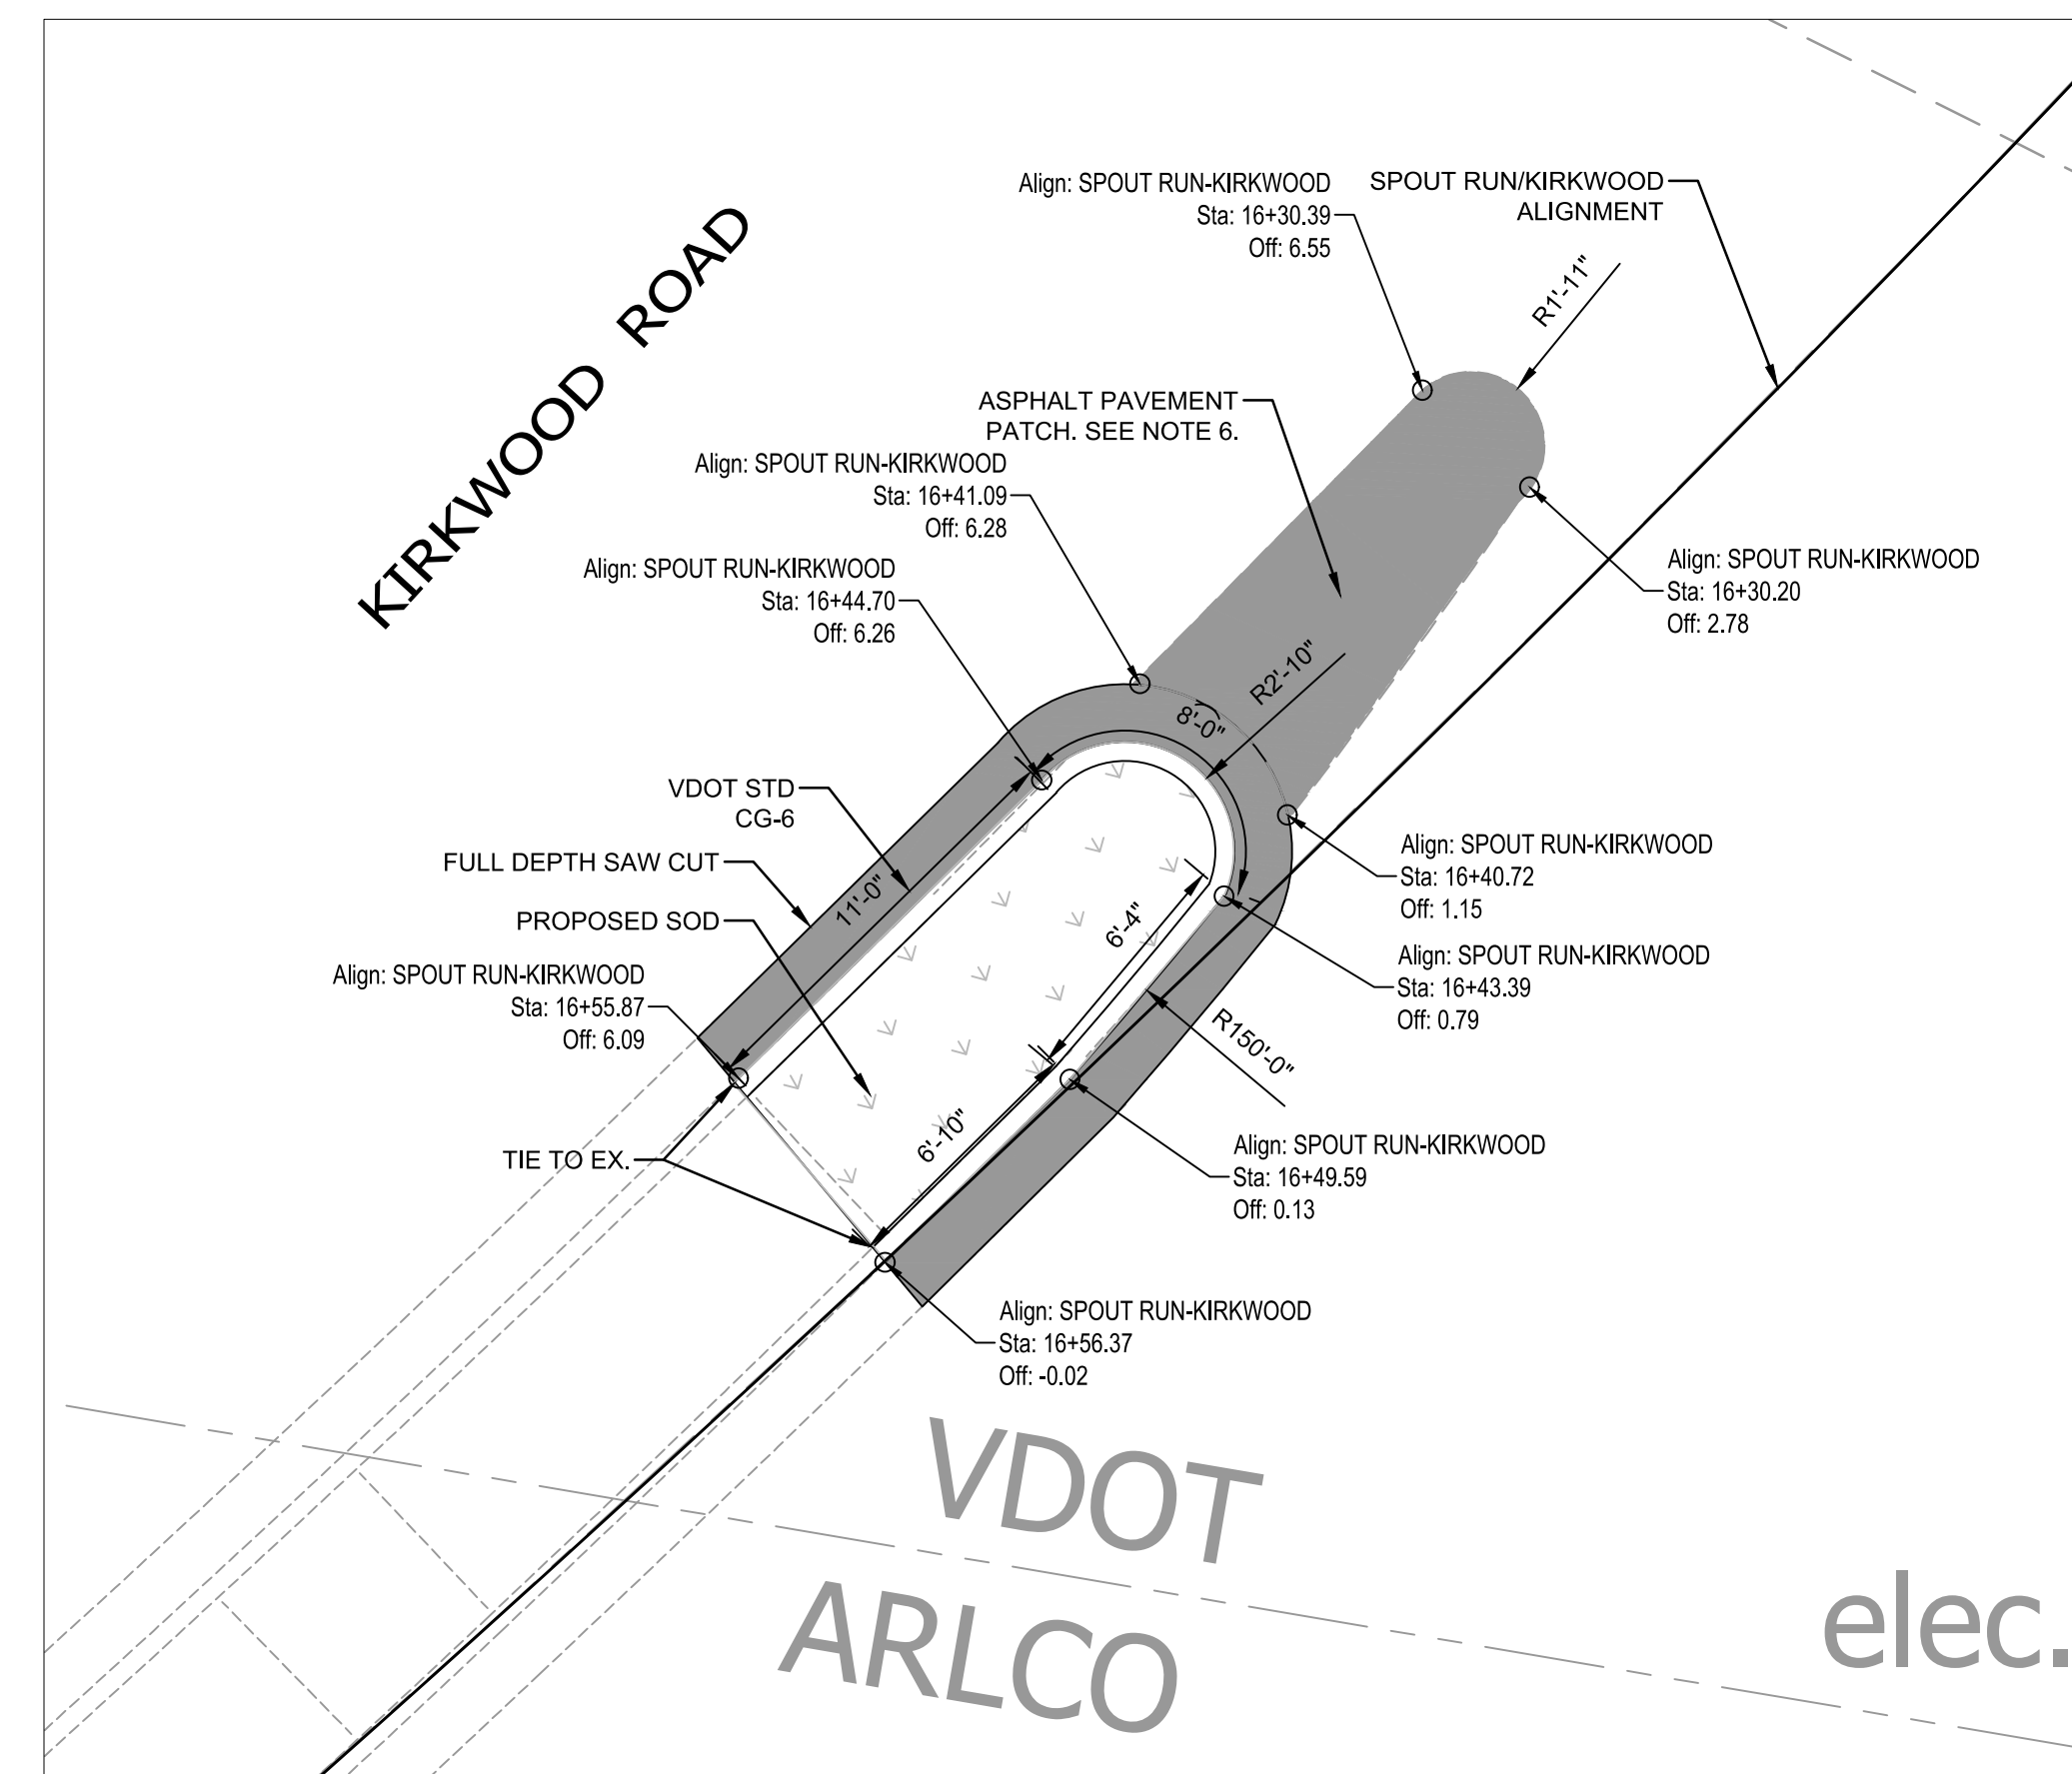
DETAIL A - CURB RAMP DETAILS AT N/W CORNER OF INTERSECTION
